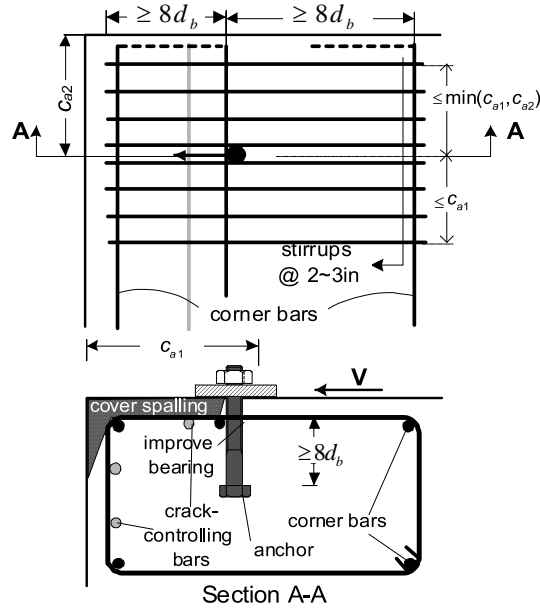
anchor reinforcement for shear.
